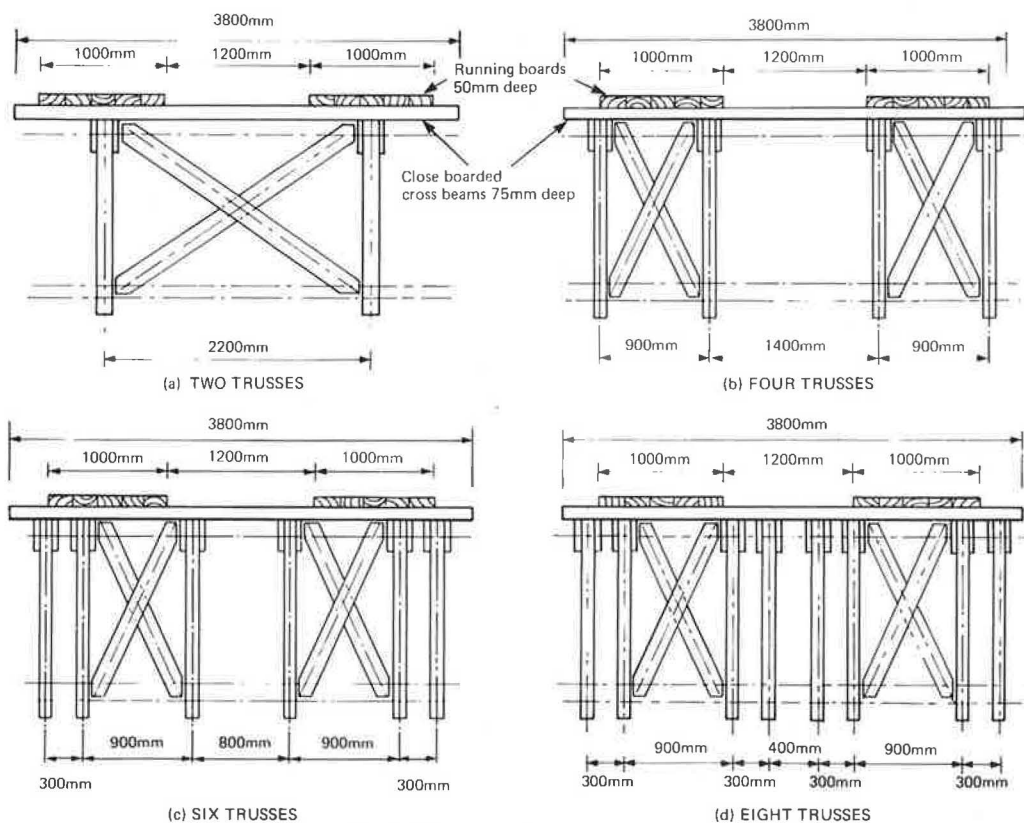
Typical cross-sections using (a) 2 trusses, (b) 4 trusses, (c) 6 trusses, and (d) 8 trusses.
